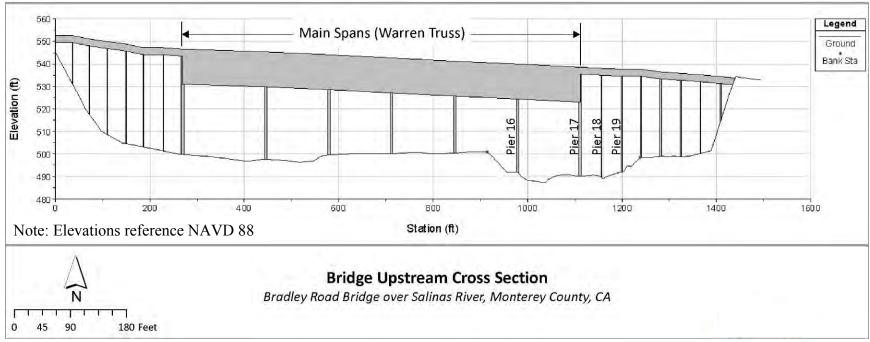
Cross Section at Upstream Side of Bridge (Facing Downstream, Northwest)
